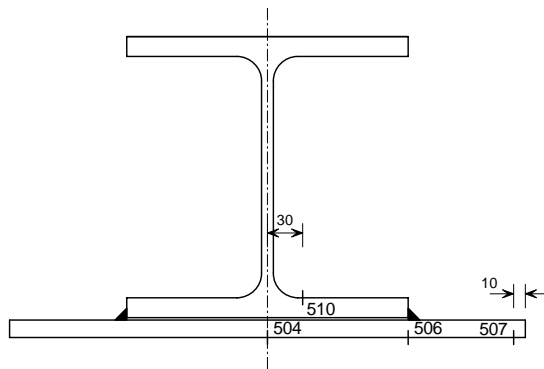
Internal beam transverse arrangement of thermocouples at position BD
